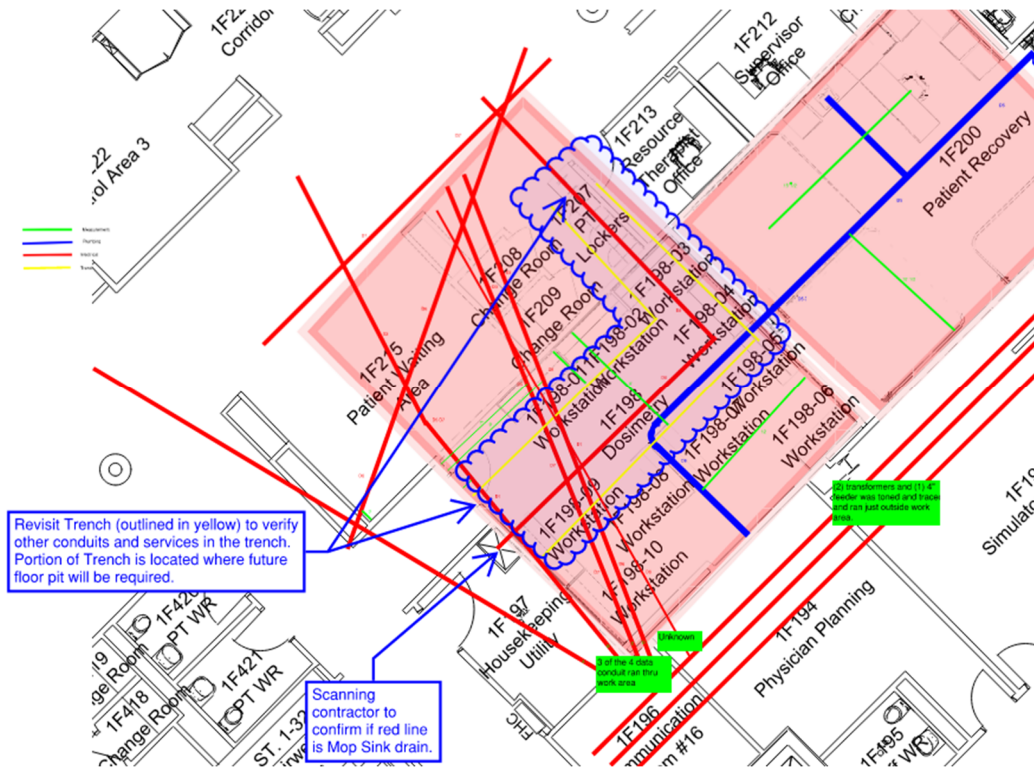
Underground conduit scan report for Halcyon #2
